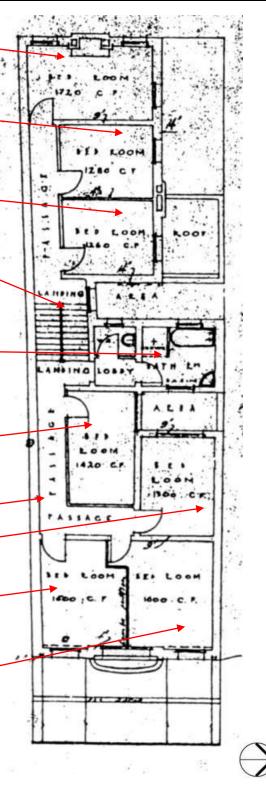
Fortune of War Hotel, 137 George Street, original second floor (front) and first floor (rear) plan. While many original internal walls, or sections of these walls, remain, there have been many changes to the planning of these areas since the building was completed. Many of these changes were the result of inserting en suite bathrooms in the late 1980s. The stair hall (1.03) remains substantially intact, as do sections of the passages that connect it to the front and rear portions of the building. Notes in italics are those taken from the survey and reproduced in the Clive Lucas, Stapleton and Partners Conservation Management Plan of 1999. Source: City of Sydney Archives BA86/1920.
